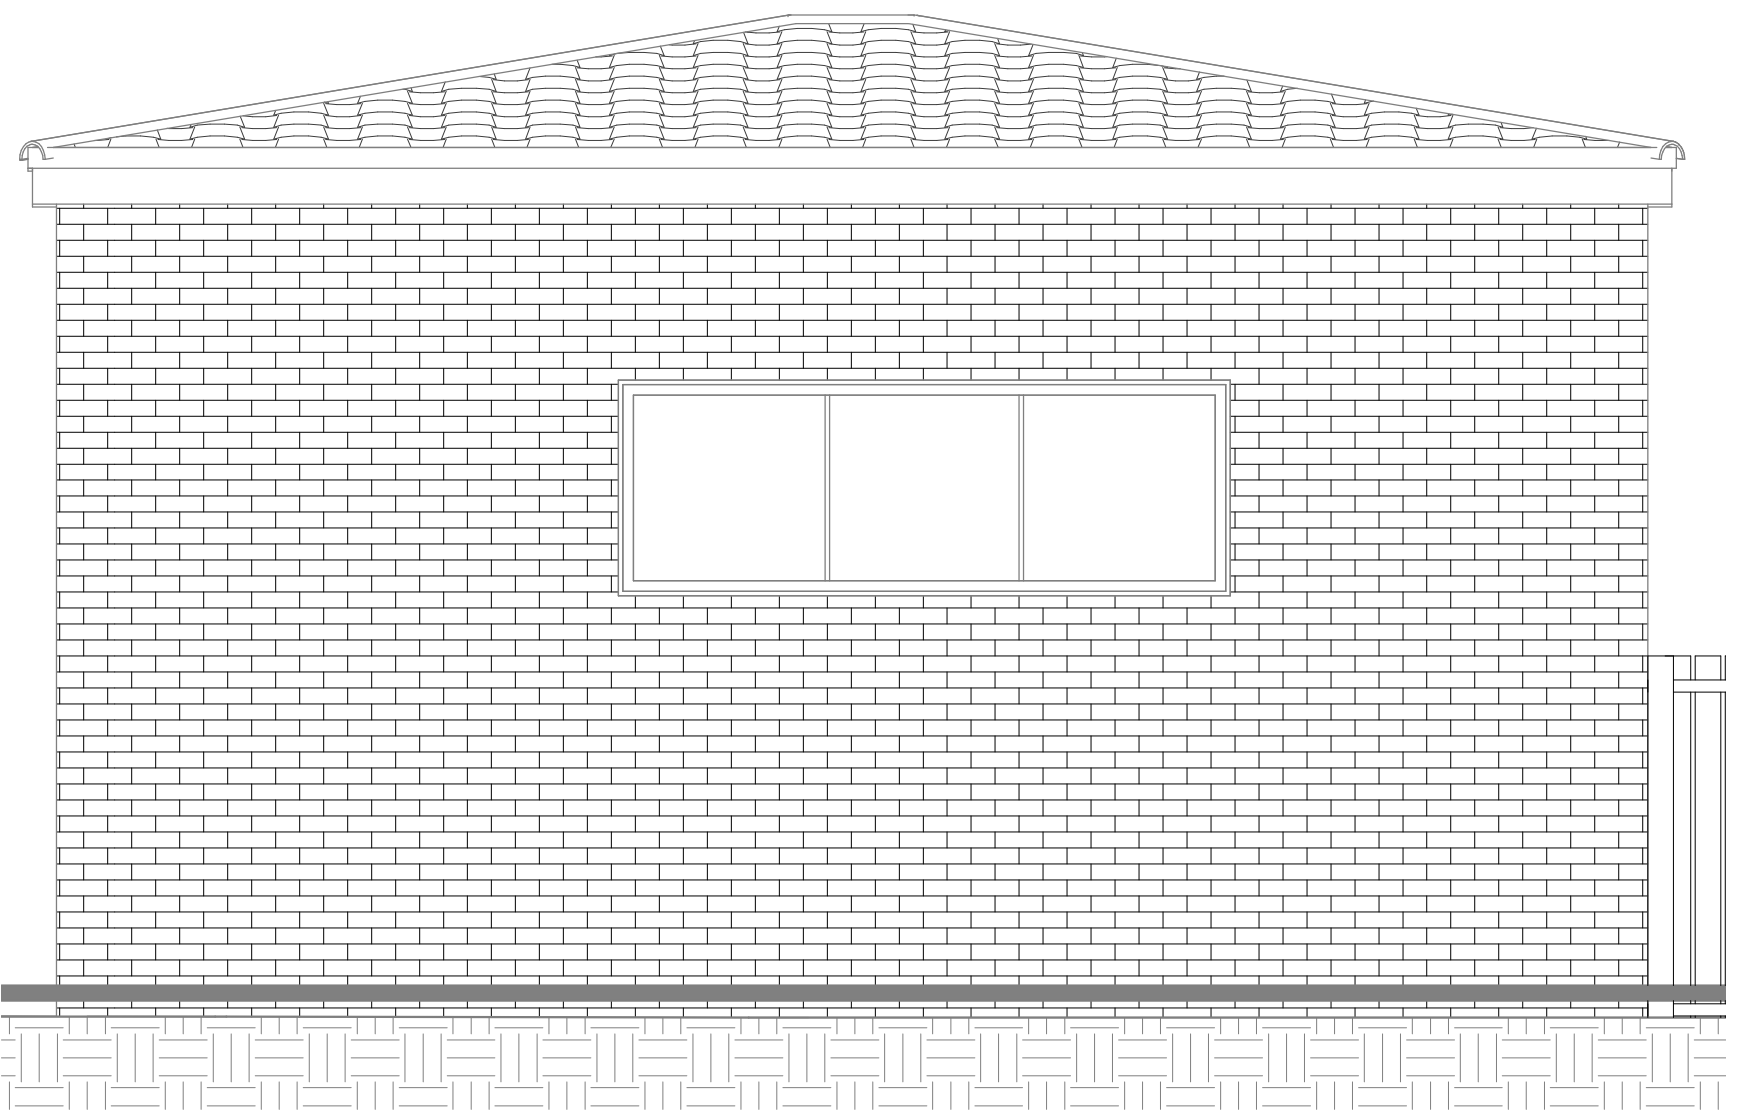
Scale: 3/8" = 1'-0" Accessory - North
